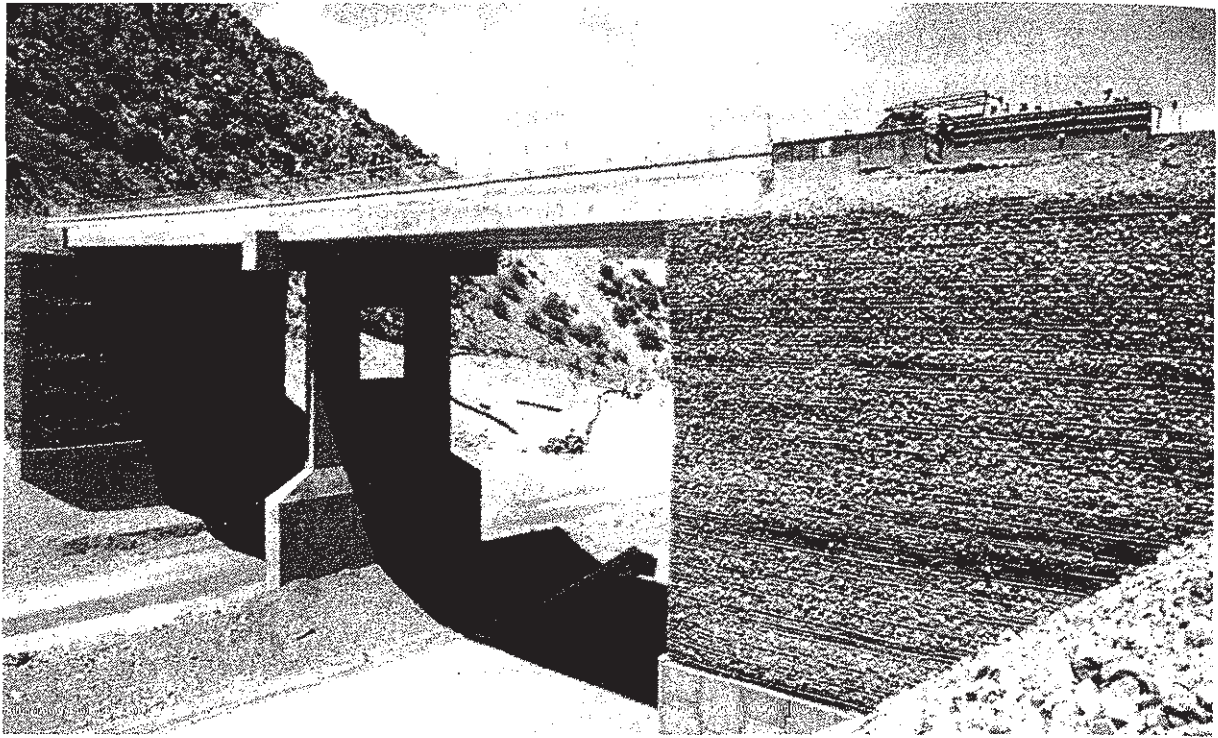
Hybrid Reinforced Earth concrete and wire-faced abutments.
